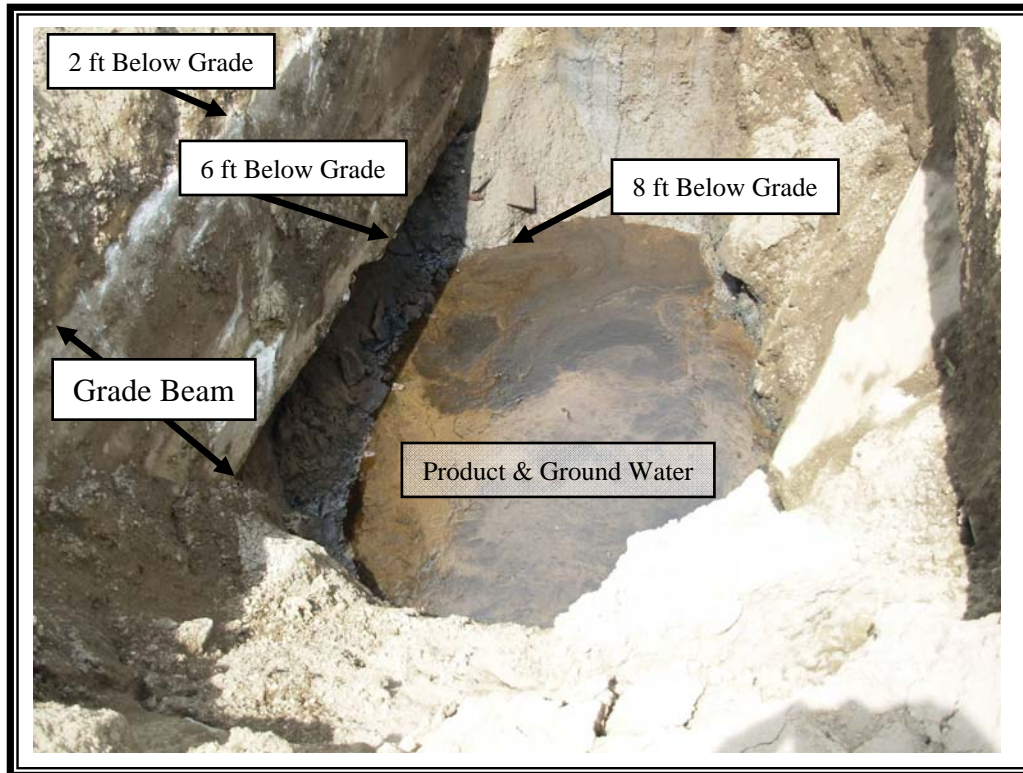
View of test pit TP-5, showing former building foundation wall (grade beam) and free-phase petroleum encountered.
